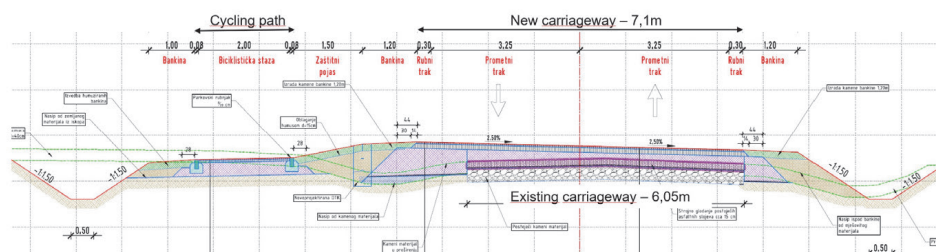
Typical cross-section of the reconstruction of state road DC213 Nemetin – Erdut, including drainage arrangement and the addition of a cycling path
